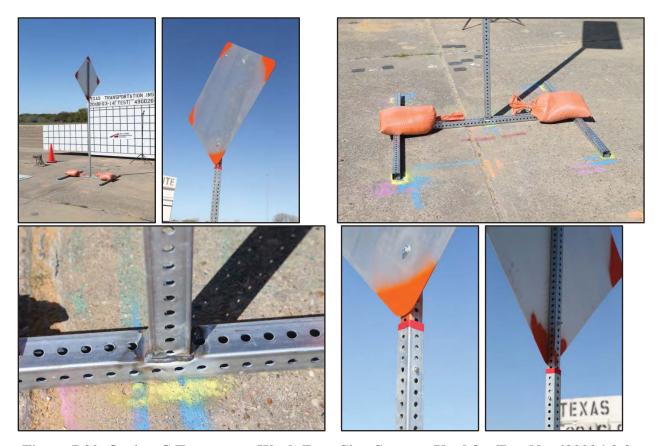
Option C Temporary Work Zone Sign Support Used for Test No. 490026-2-9.
